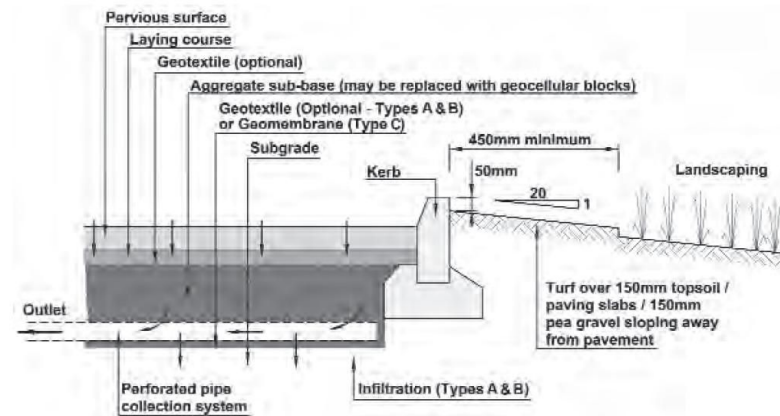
Landscaping detail for pervious pavement (adapted from Wilson et al, 2004)
